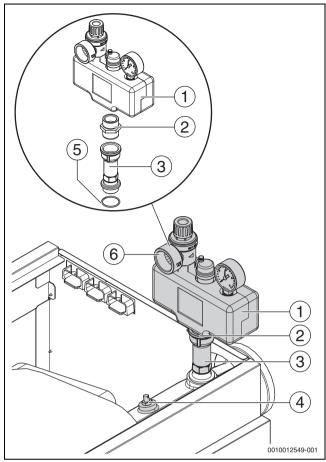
Safety set, 3 bar (illustration shows right-hand boiler setup)
